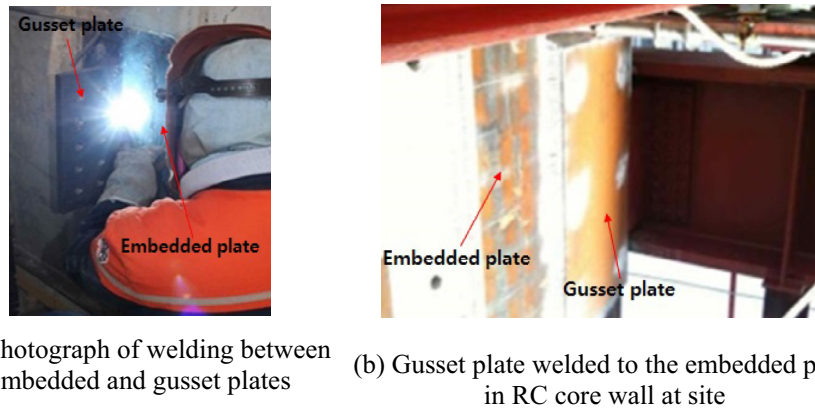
Connection between steel girder to RC core wall using the gusset plate welded to the embedded plate at site.
